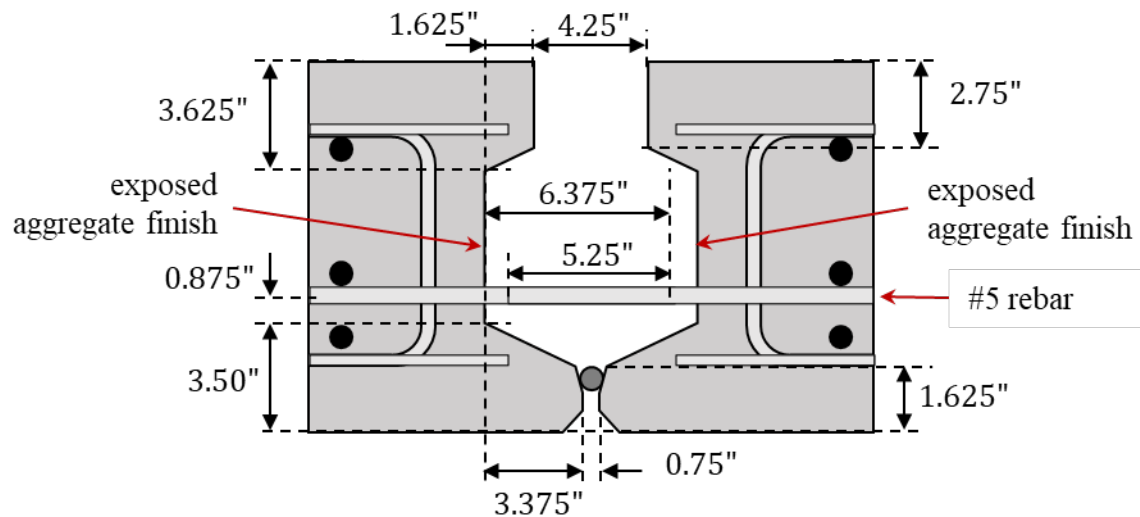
Proposed joint geometry based on small-scale joint testing and two-beam system tests
